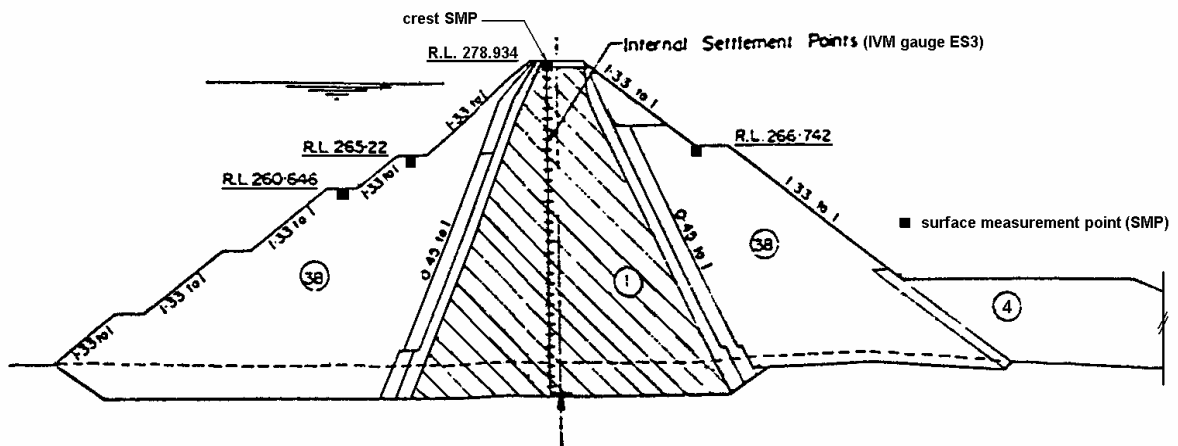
Bellfield dam, instrumentation layout at main section (courtesy of Wimmera Mallee Water).
